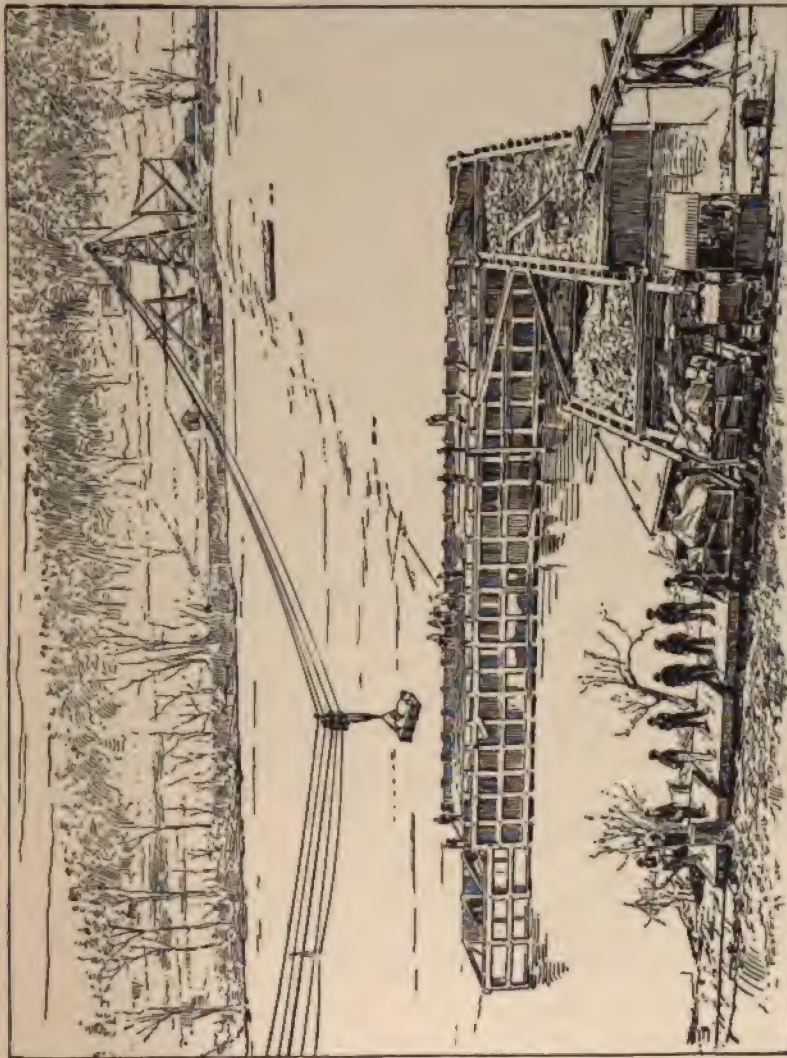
LIDGERWOOD CABLEWAY AT COOSA DAM. SPAN 1012 FEET.
